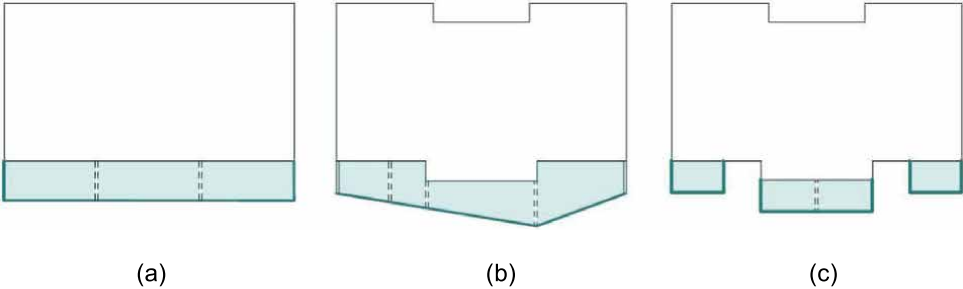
Balcony alternatives: (a) full facade balcony; (b) shaped balcony; and (c) individual balconies.
